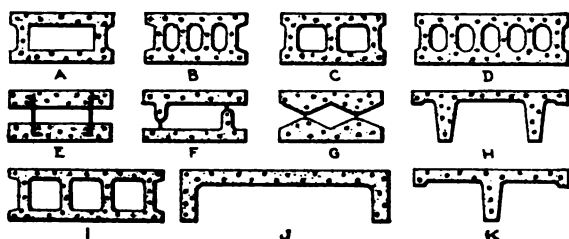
Horizontal cross-sections of representative types of concrete block.
